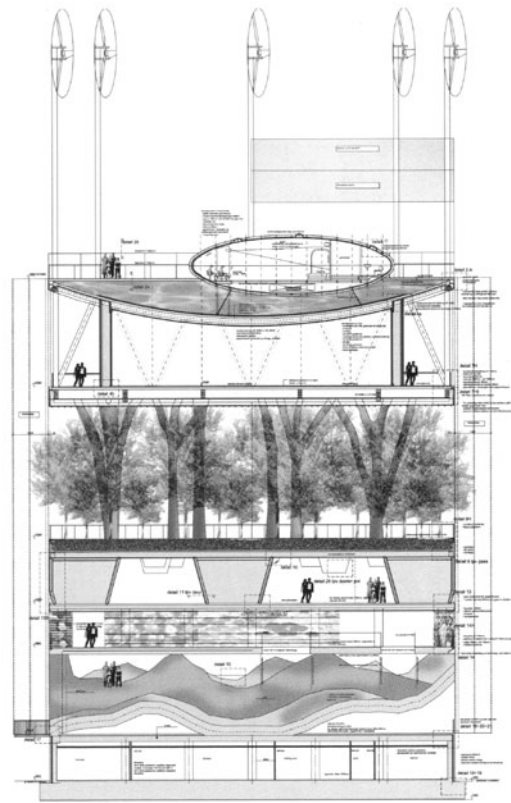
Building section, MVRDV, Dutch Pavilion, Expo 2000, Hannover, Germany, 2000
